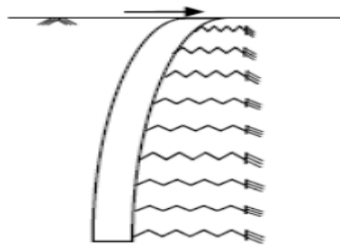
Laterally loaded pile with beam-on-foundation approach
